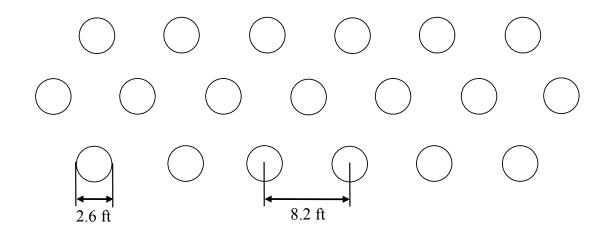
Equilateral triangle stone column layout for the Cherry Hill Bridge case history.
